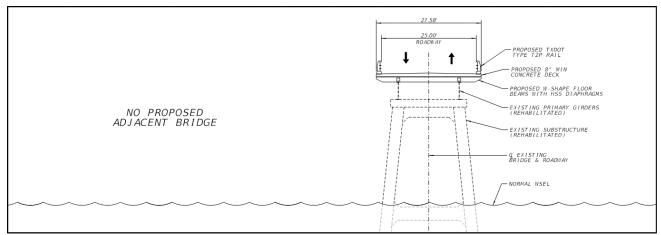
Alternative 2A Typical Section (Approach Spans – Not Showing Substructure Retrofits)
